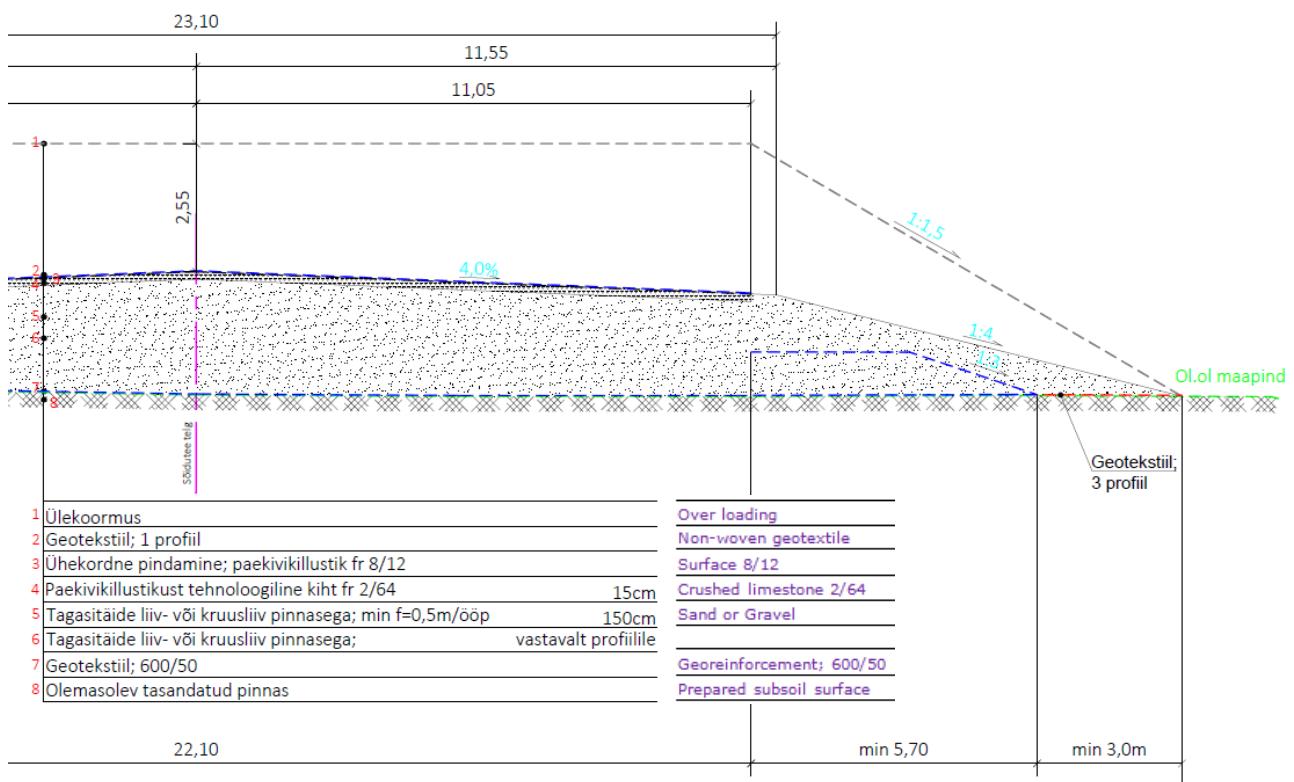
Cross-section of section 1 (one layer of georeinforcement)
